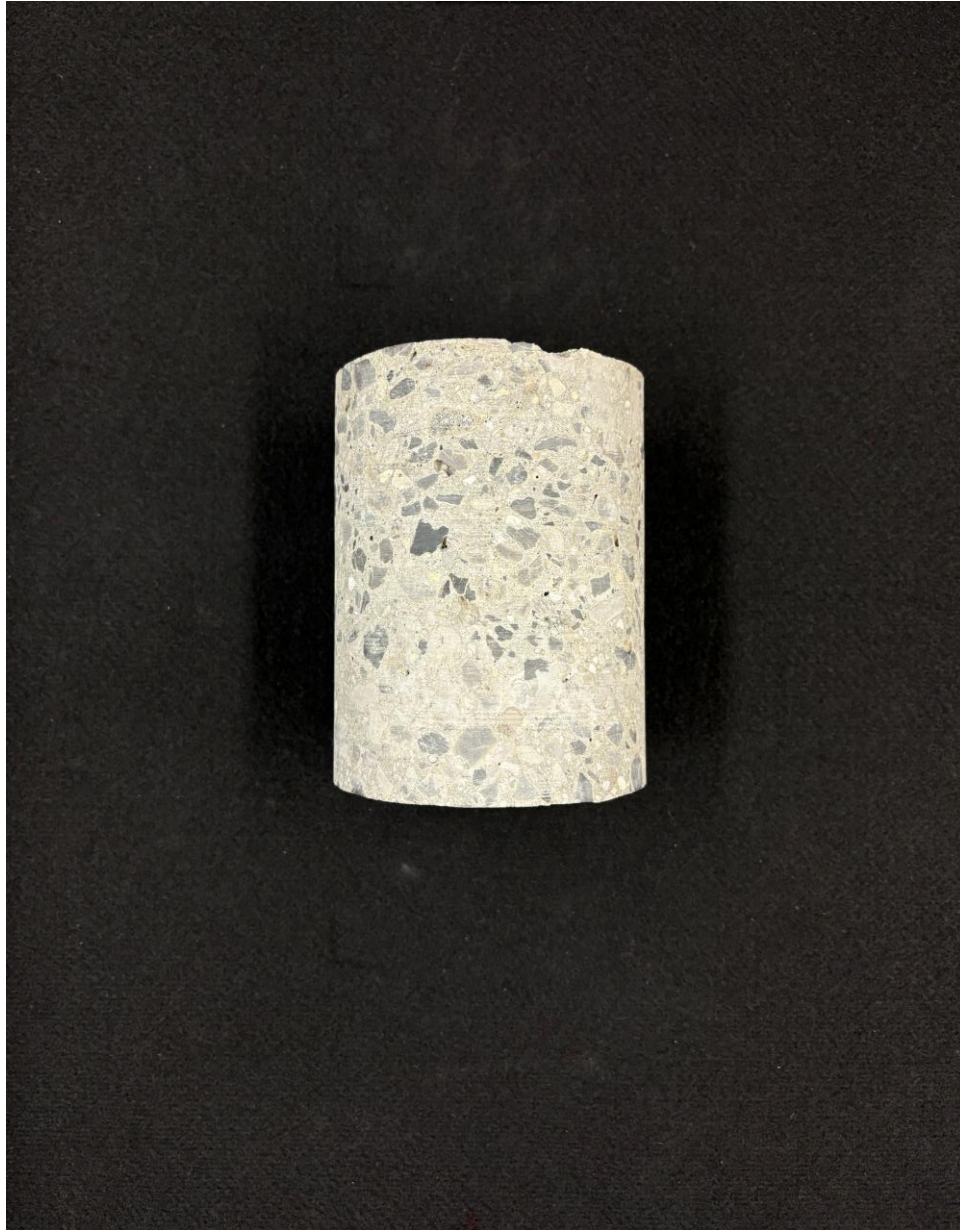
Core 3 of lightweight concrete deck at bridge F-792.
